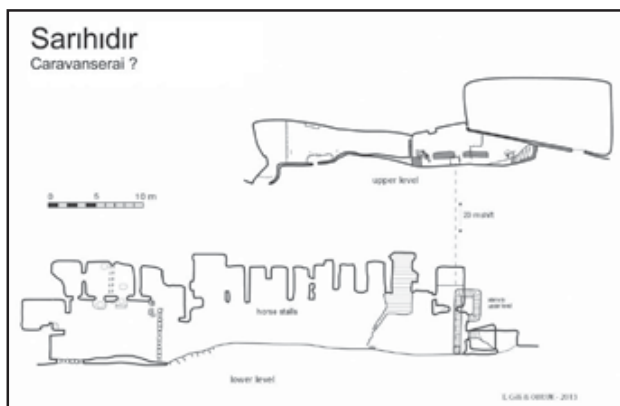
Plan of Caravanserai's first and second floors (drawing: E. Gilli).
